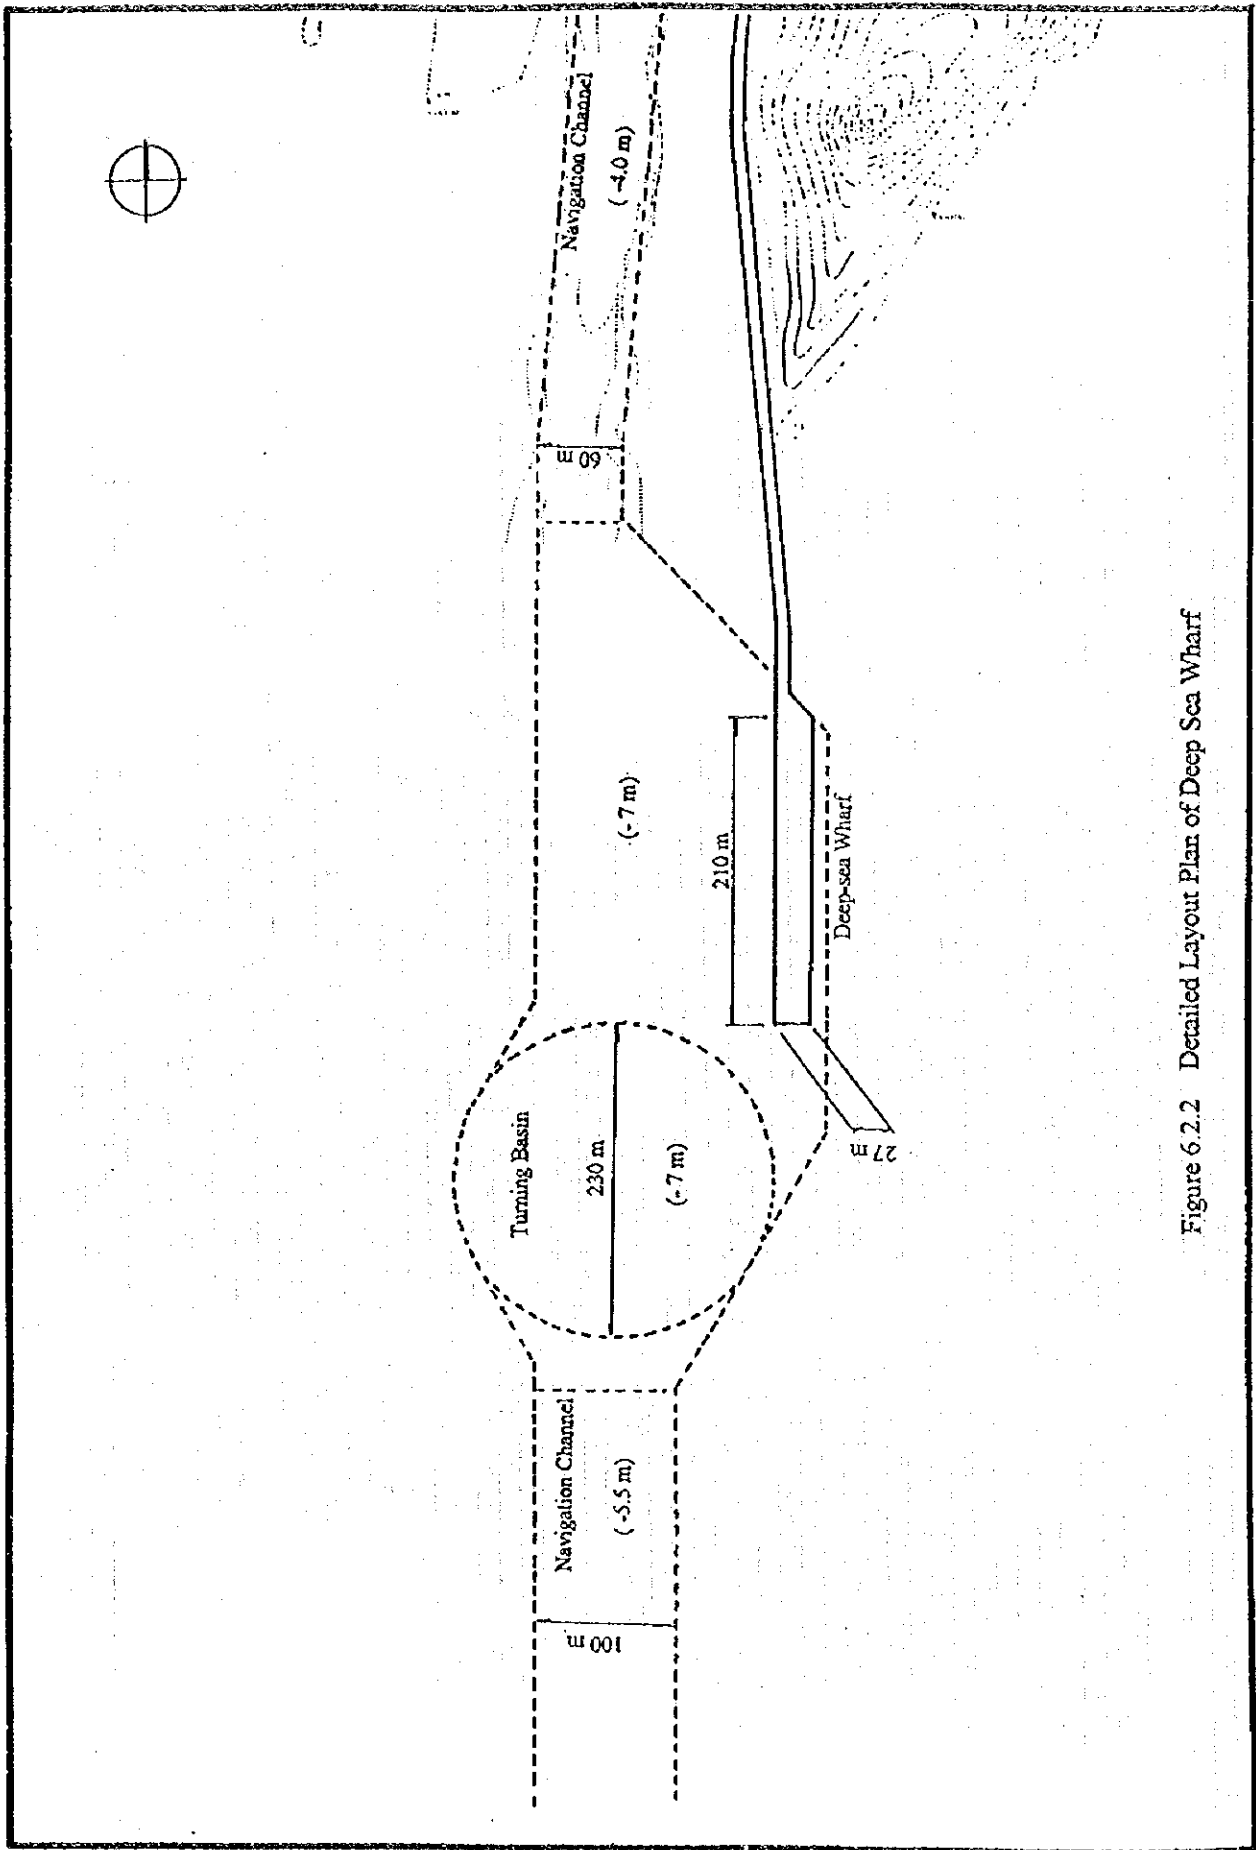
Detailed Layout Plan of Deep Sea Wharf
